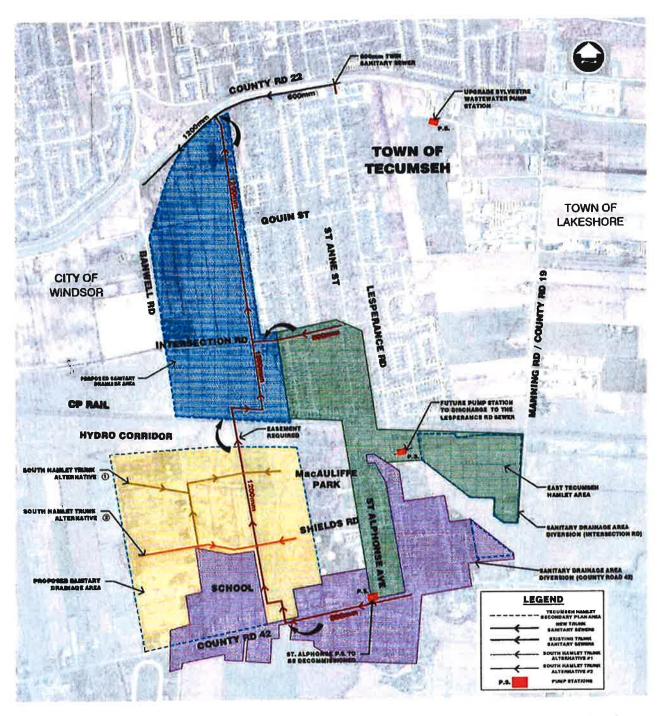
Future Plan (DRAFT) to Divert Sanitary Flows to the West Tecumseh Trunk Sewer (1200 mm dia) via Proposed Trunk (600 mm dia) Sewers on Intersection Road and County Road 42
